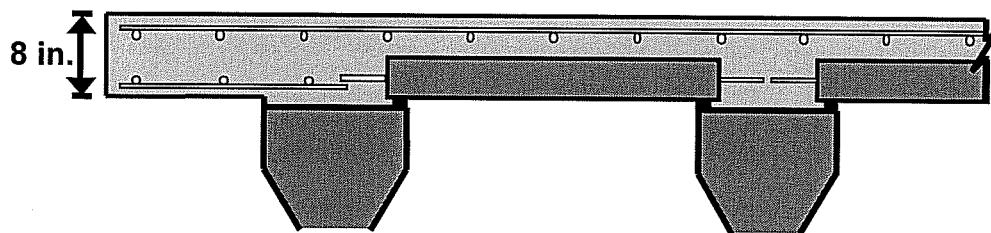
Elevation of precast panels and cast-in-place concrete topping
